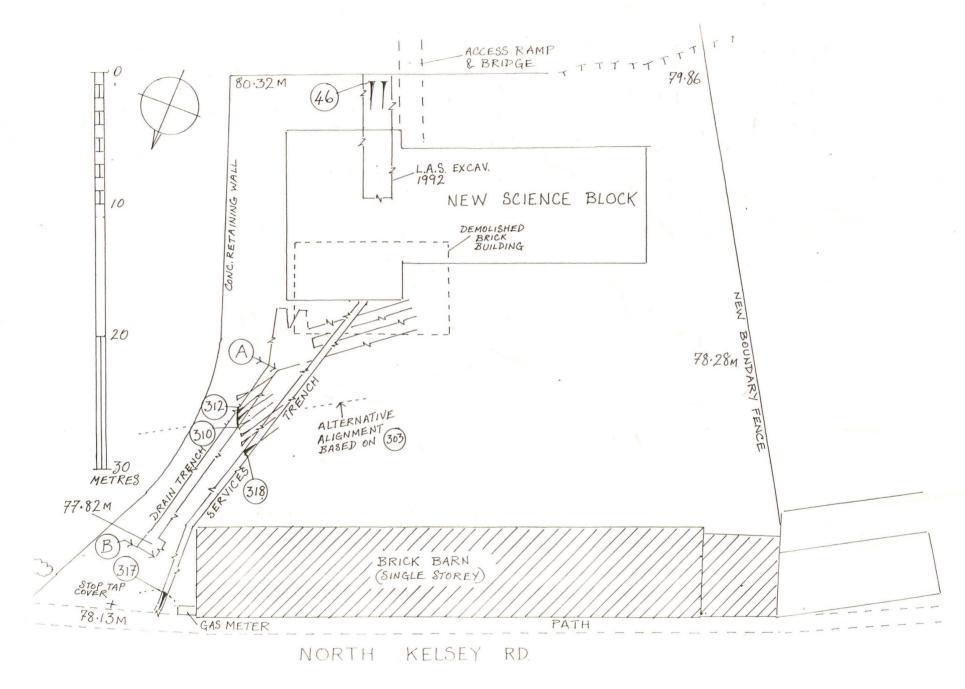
Plan showing new block and route of service and drainage trenches. M.V.Clark 1993
